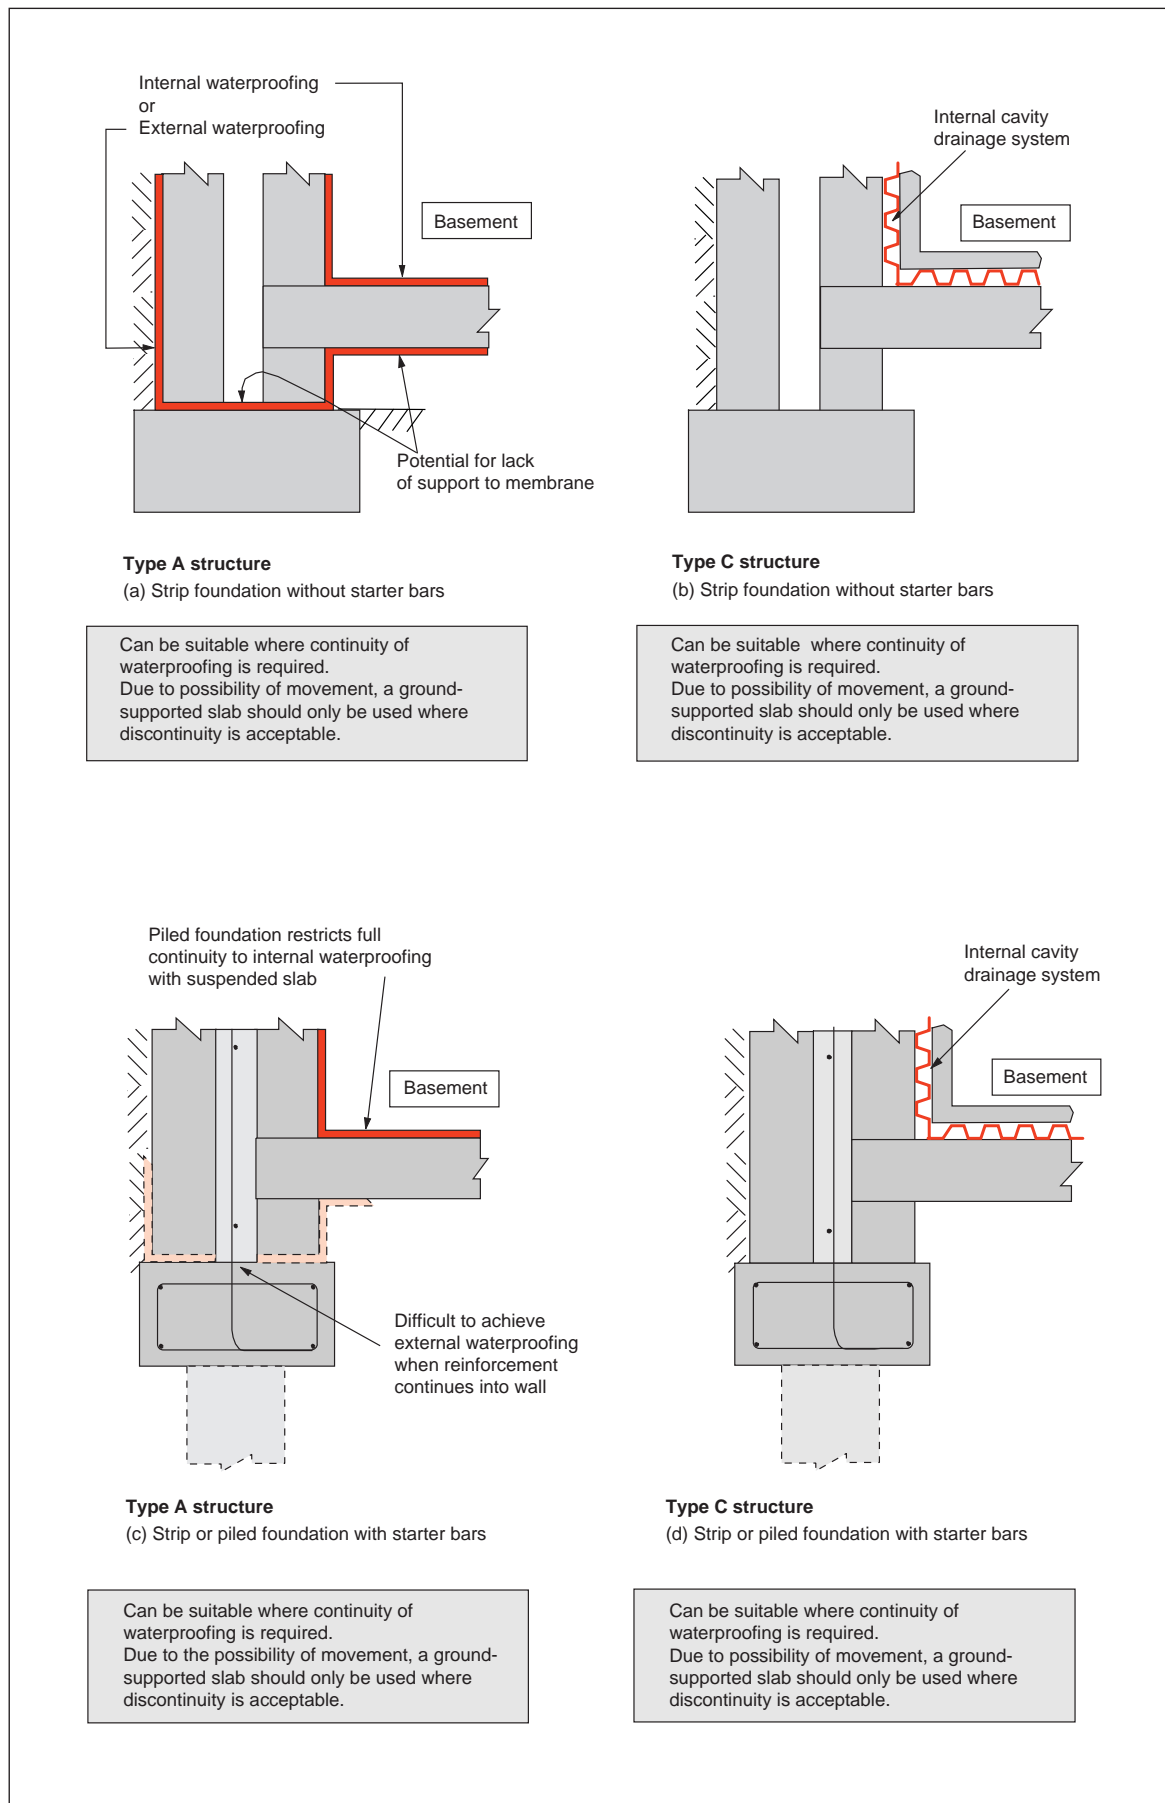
A.3 Discontinuity of waterproofing on free-draining site
